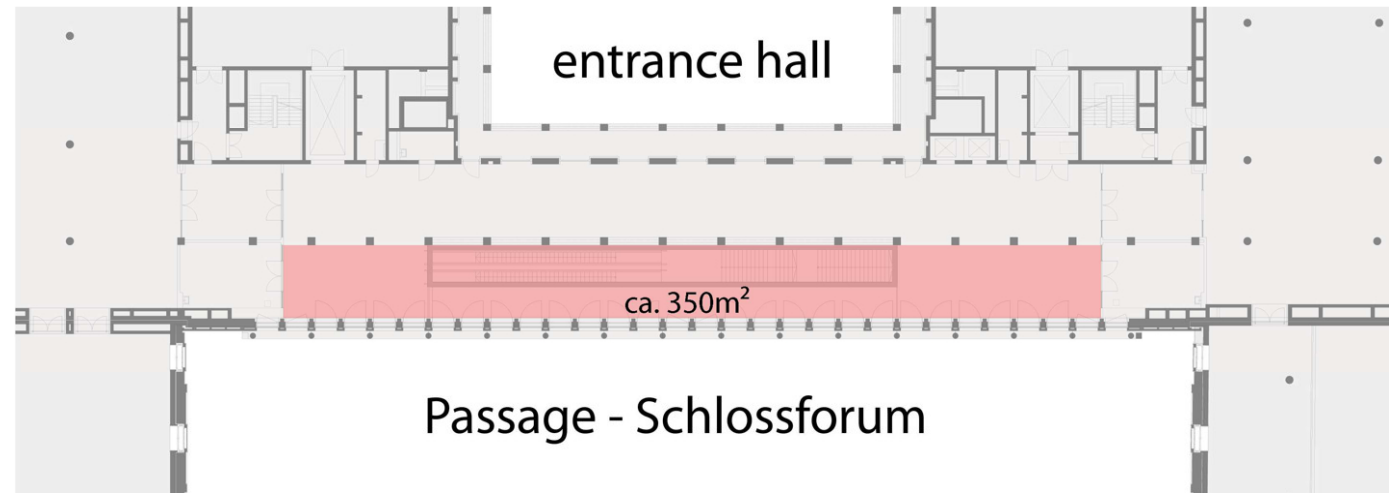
Floorplan of 3rd storey with marked ceiling area, Source: FSPG, prepared by BBR
